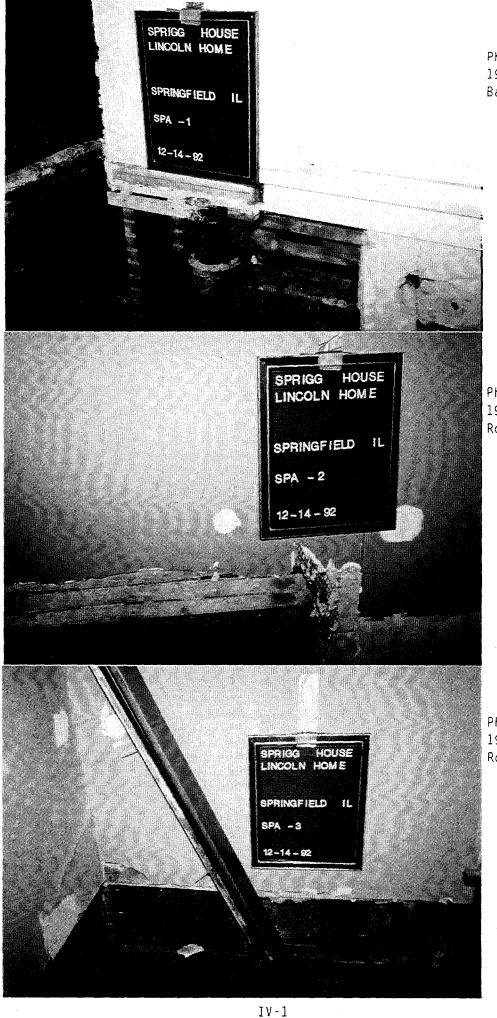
1922 Plaster Bathroom 201A-Wall
